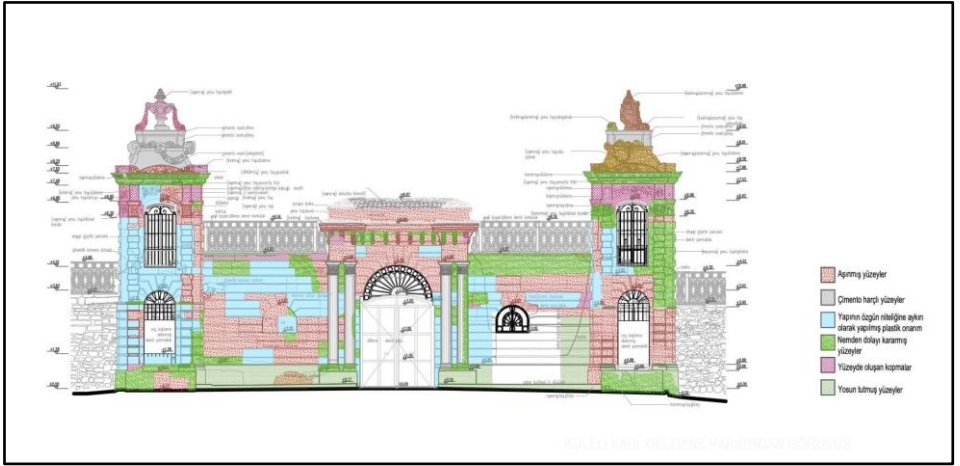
Mecidiye Gate Deterioration Analyze, Gülhane Facade (Author Archive, Bimtaş, 2009)
